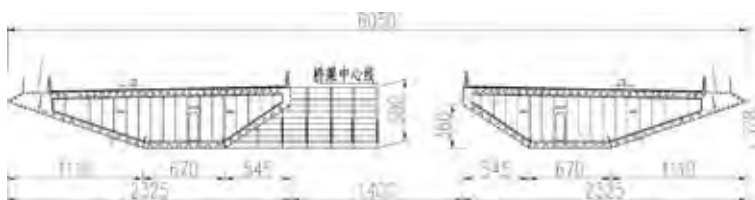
Girder cross section of Qiongzhou Strait Cable-Stayed Bridge
